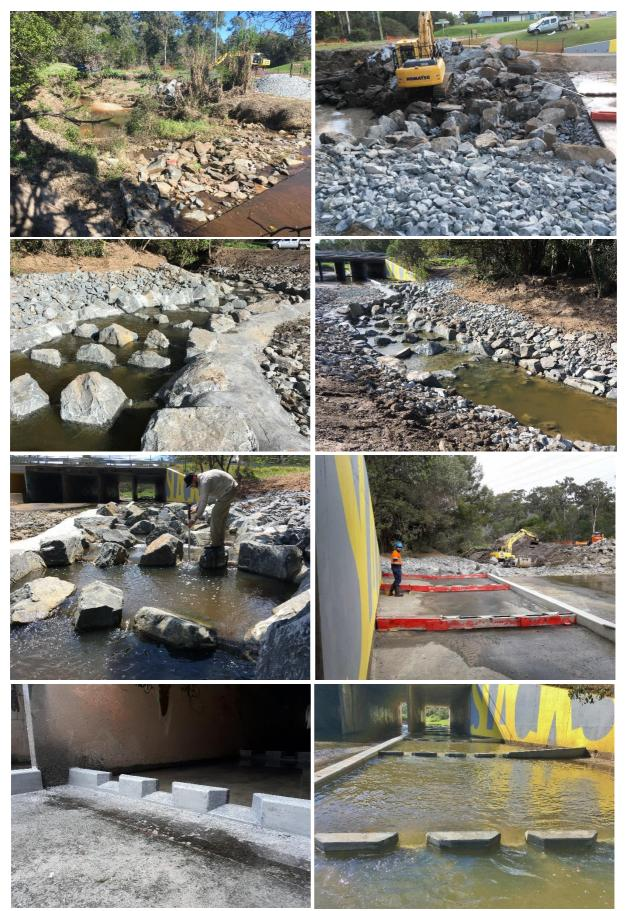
Showing during and post construction of the rock-ramp and horizontal culvert baffle fishways
